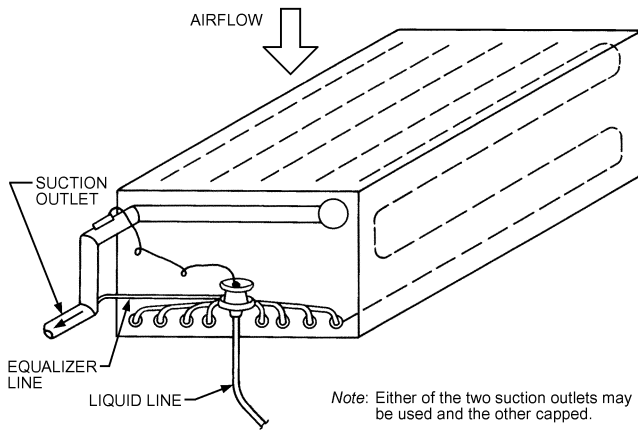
Direct-Expansion Evaporator (Bottom-Feed)
